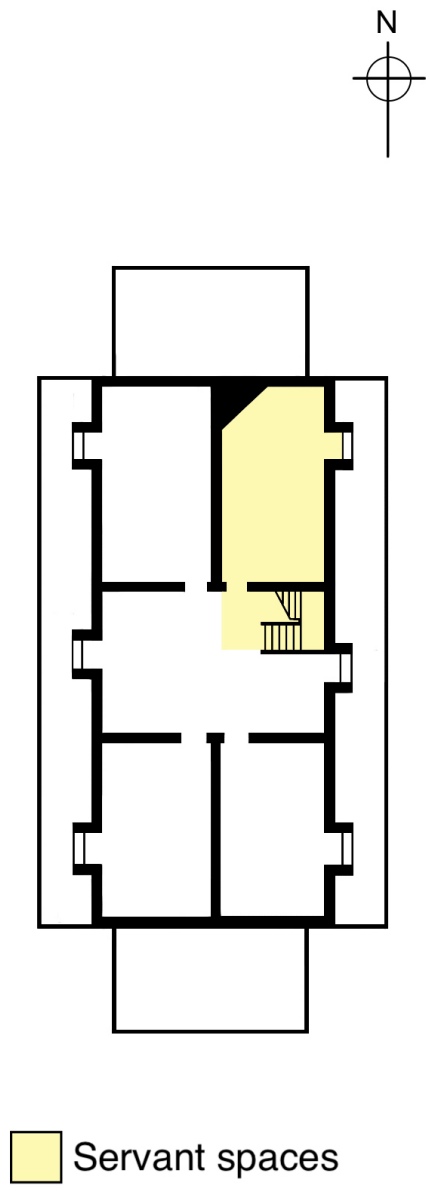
Mount Vernon c1759 Phase 1 second floor plan
